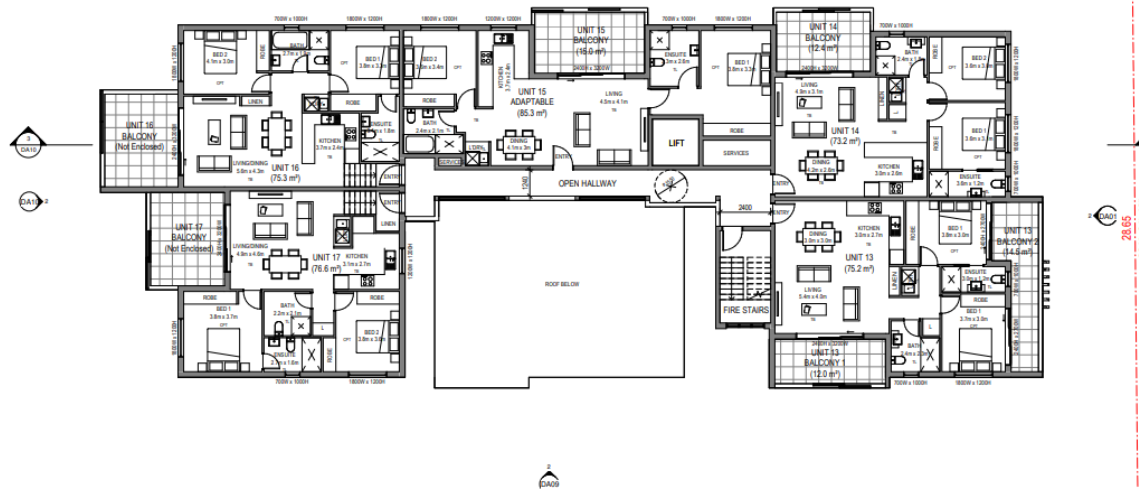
Extract of proposed level (floors 2-3 contain the same similar floor plate) (Source: Colin De Lore and Associates, 2023).
